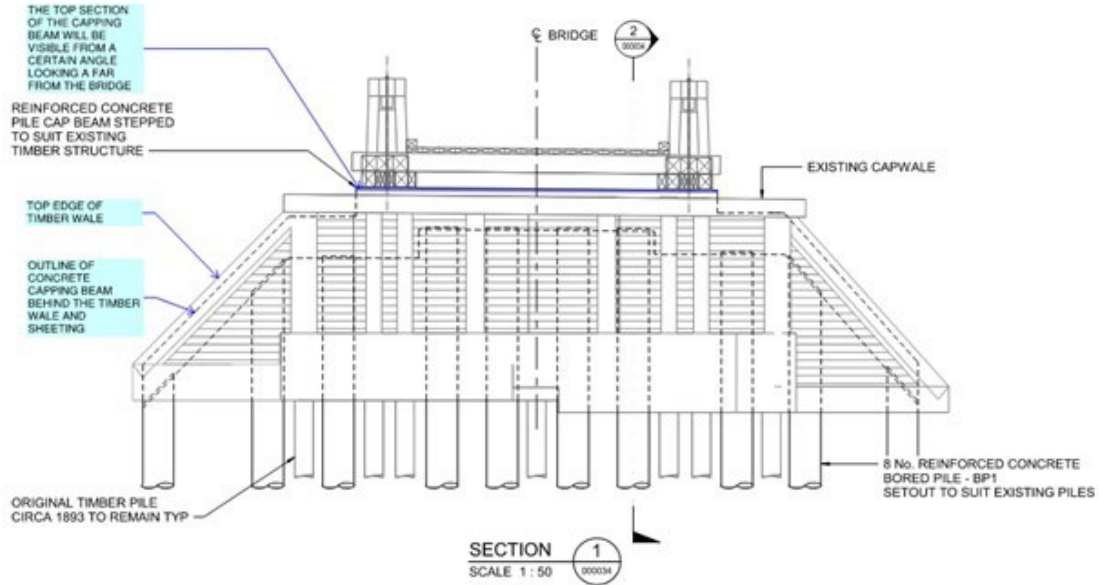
Proposed extent of concrete behind North Abutment (B) sheeting. (Source: Aurecon markup of 520212TP-AURC-B00390-ST-DRG-000034 and Design Report, Aurecon 2023)
